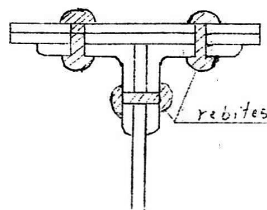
Typical assembly of steel elements by rivets Edgar Cardoso
